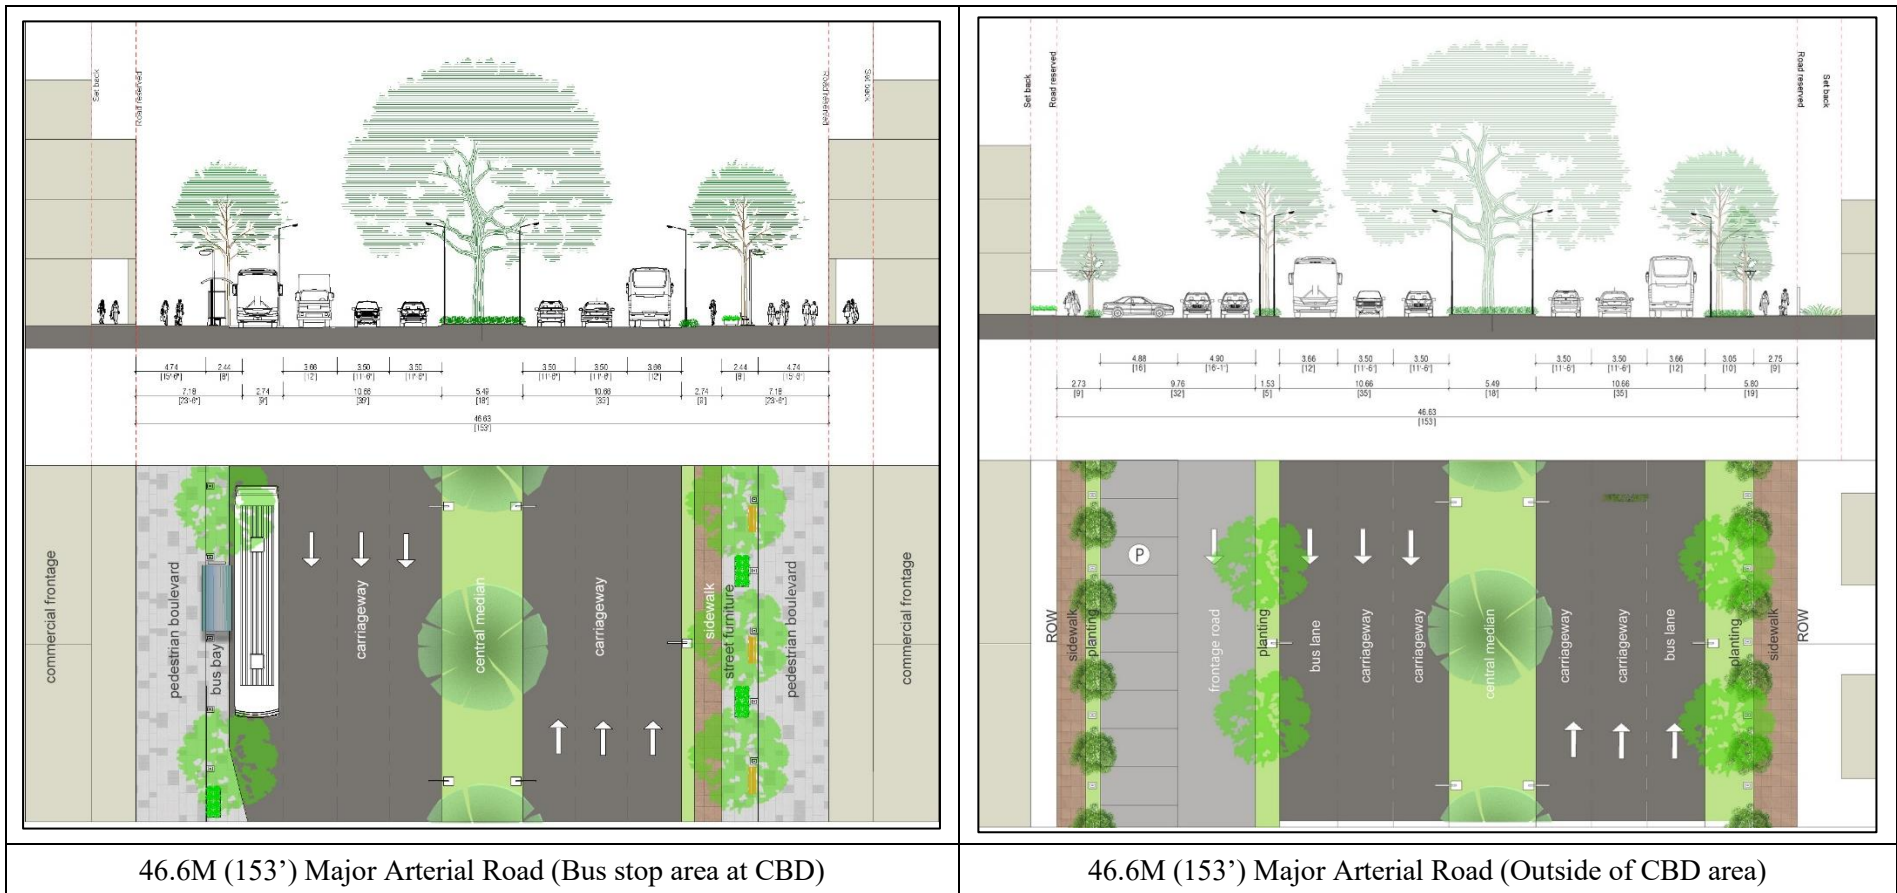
Typical Section of Major Arterial Road (Bus Stop Area at CBD and Outside)
